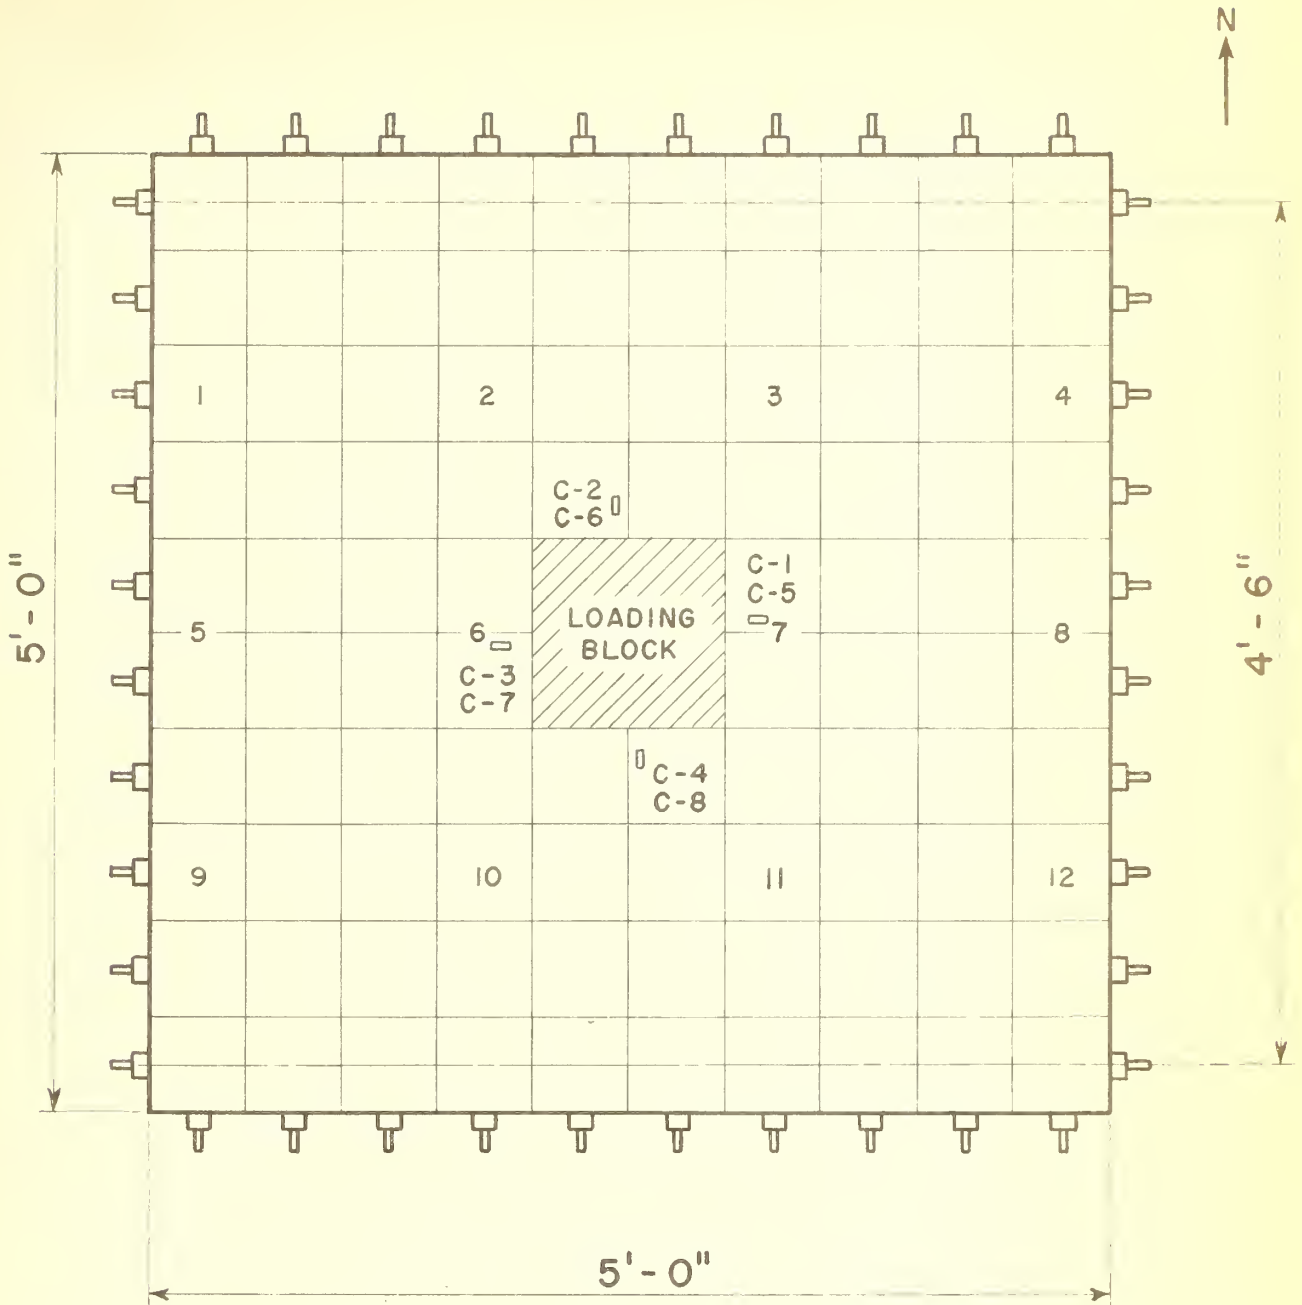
TEST SET-UP OF SLAB NO. 9 ON CONCRETE FRAME
